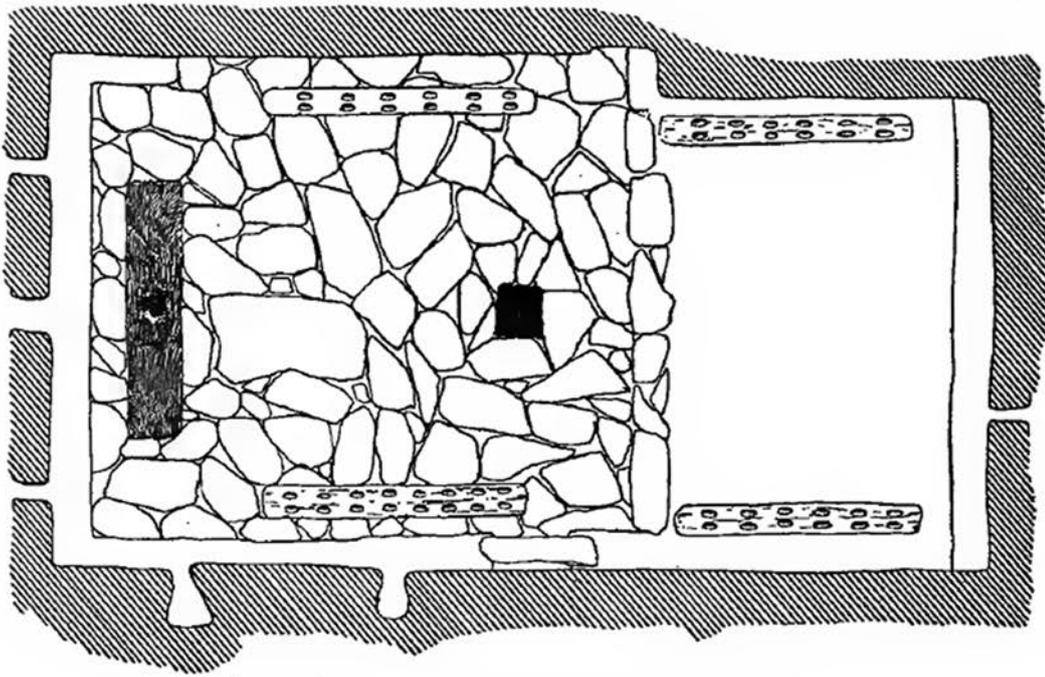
Ground plan of the chief kiva of Mashónnavi.
